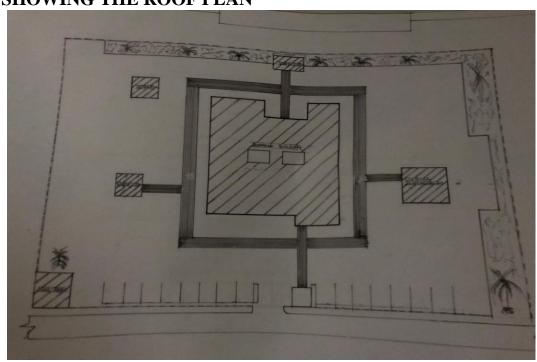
SHOWING THE PROPOSED SITE PLAN
